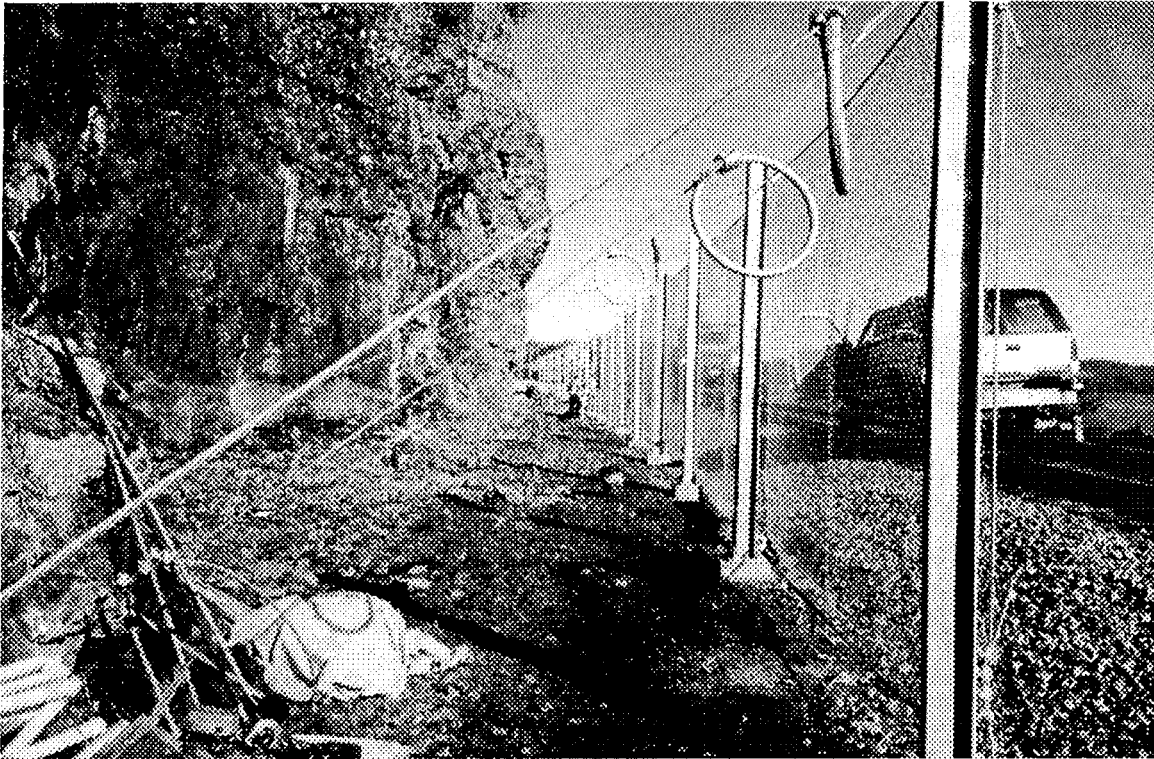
Brugg fence with net panels hung, preparing for final electrical connection, 11 September 2001.
